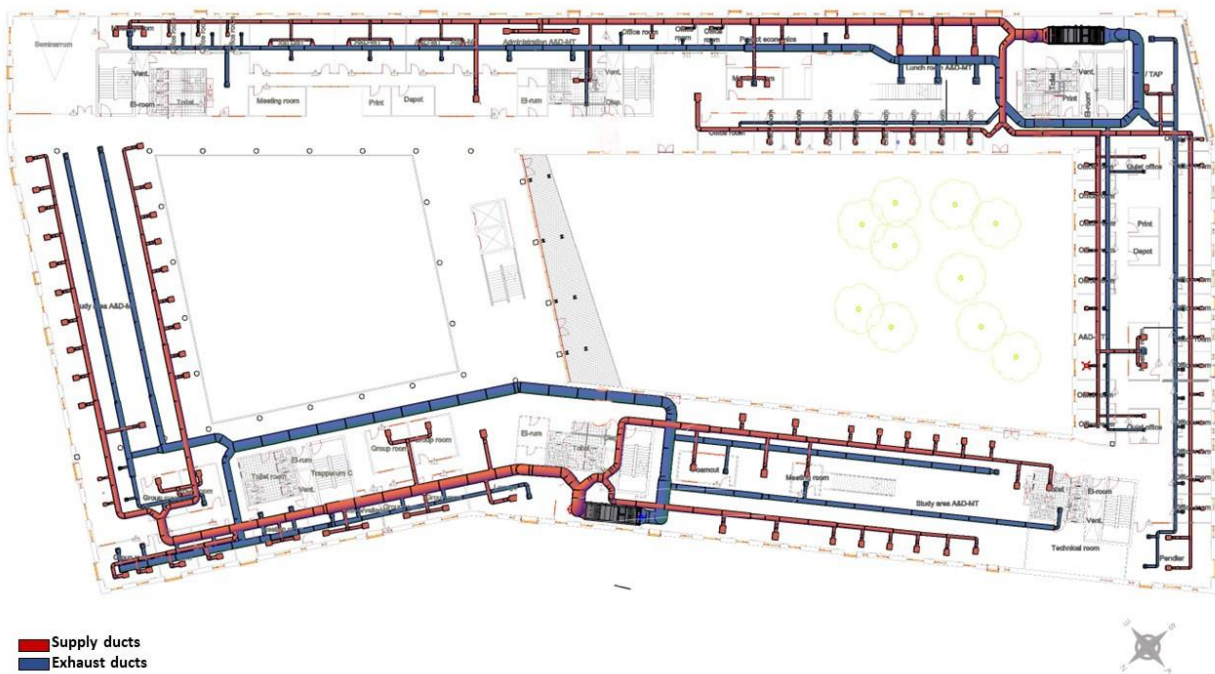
Ventilation layout in City Campus Aalborg building applying galvanized steel ductwork.
